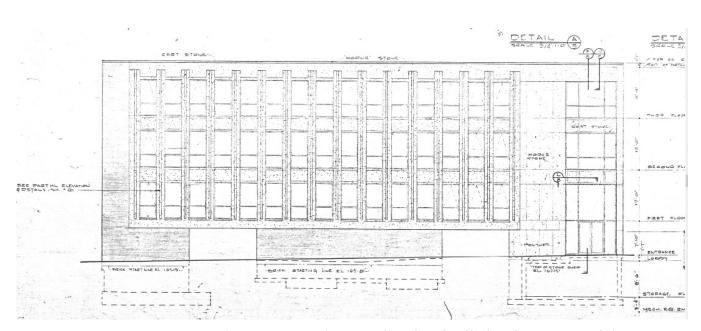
22-24 E. Cary Street (127-5816-0017), 1967 elevation detail, drawing no. 5, Wright, Jones & Wilkerson, Architects, August 1967.
